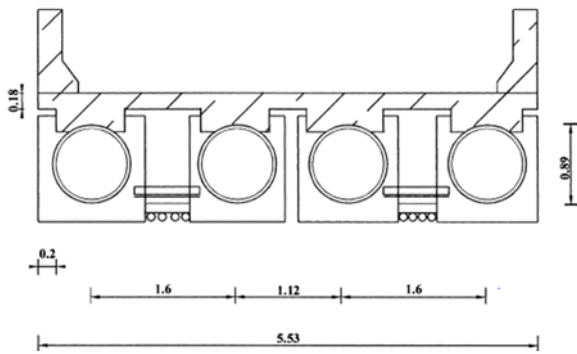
SECTION DETAILS OF THE BRIDGE DECK
